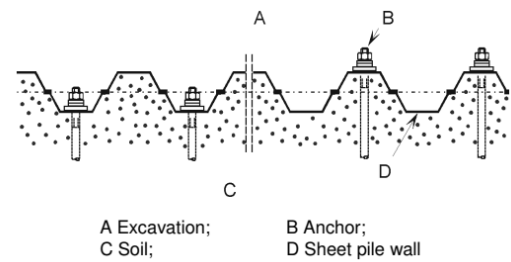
Example of anchoring with a waling behind the sheet pile wall
